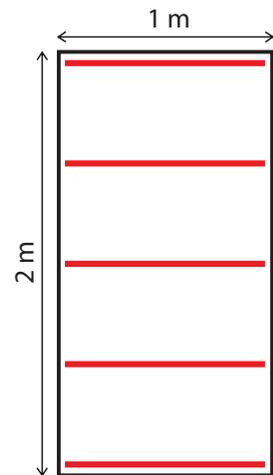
Fitting band installed in parallel to a 1 m wall.
